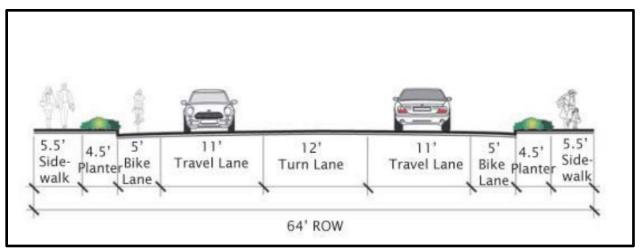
2007 Community Action Plan State Route 1 streetscape cross section, looking north from Church Street to Ocean Drive.
